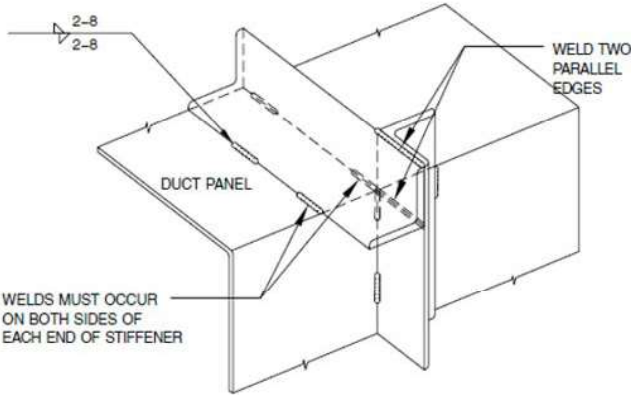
Fixed Reinforcement Stiffeners (Back to Back - Heel Down)
